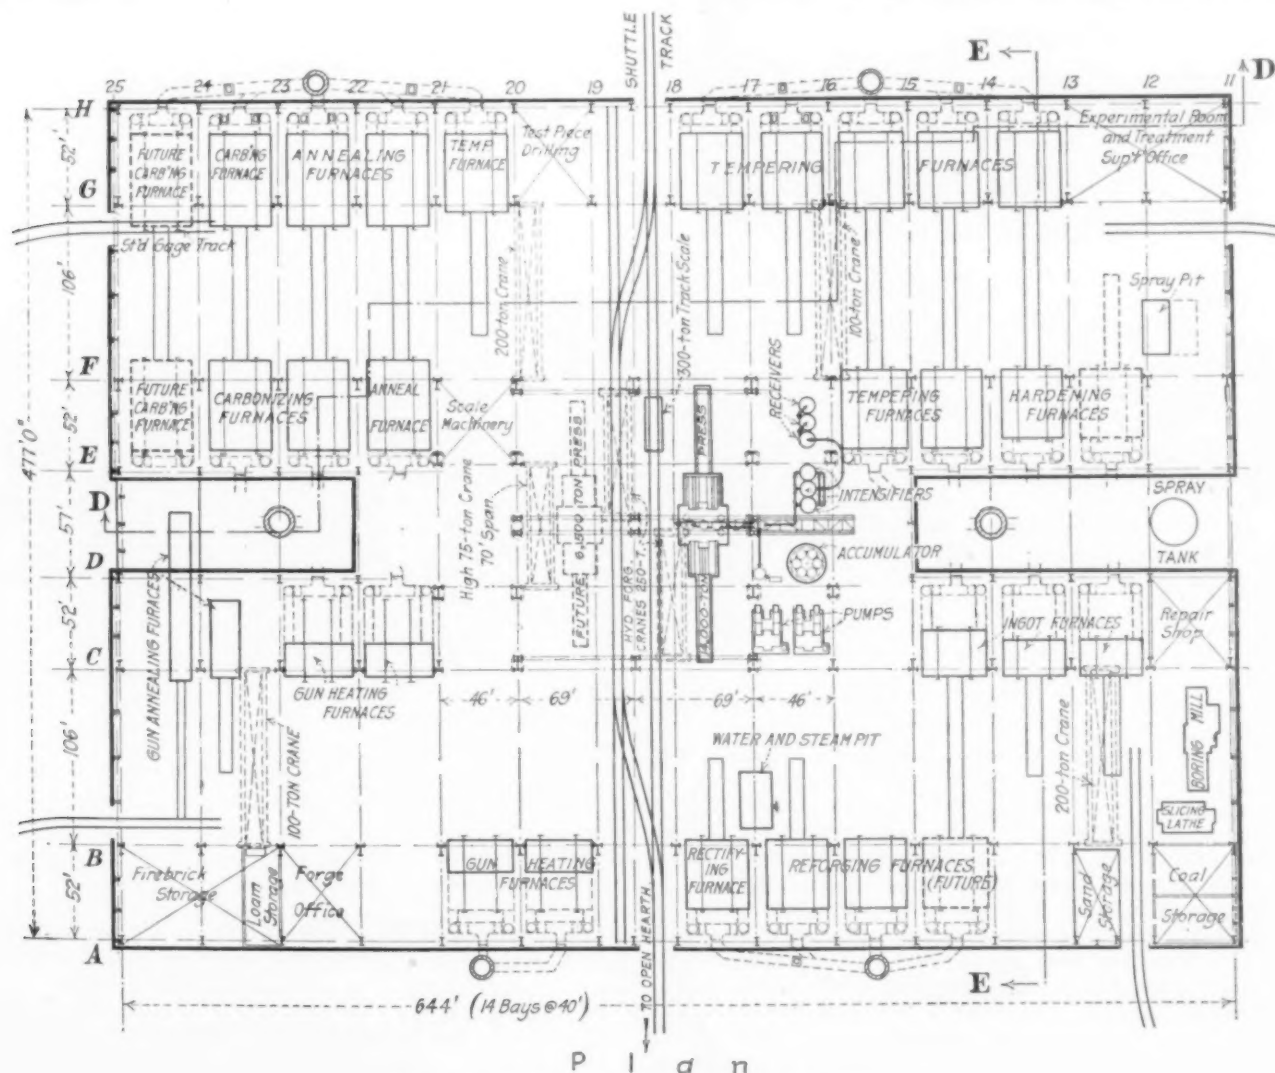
FLOOR PLAN OF FORGE AND FURNACE BUILDING
